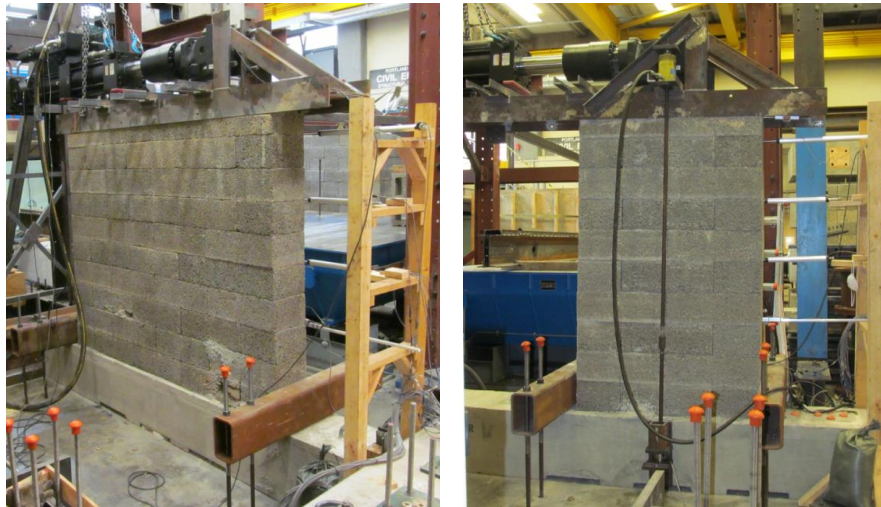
Long wall without gravity loading (left) and short wall with gravity loading (right).
